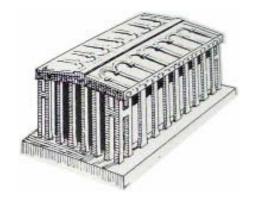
& picture 11 Axumite elements of roof decoration at Bete Medhane Alem
